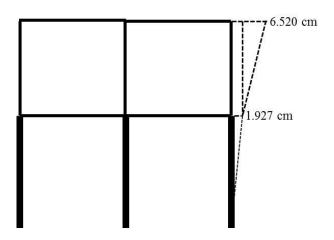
Sway mode due to earthquake load acting on the frame structure of coconut-timber house
